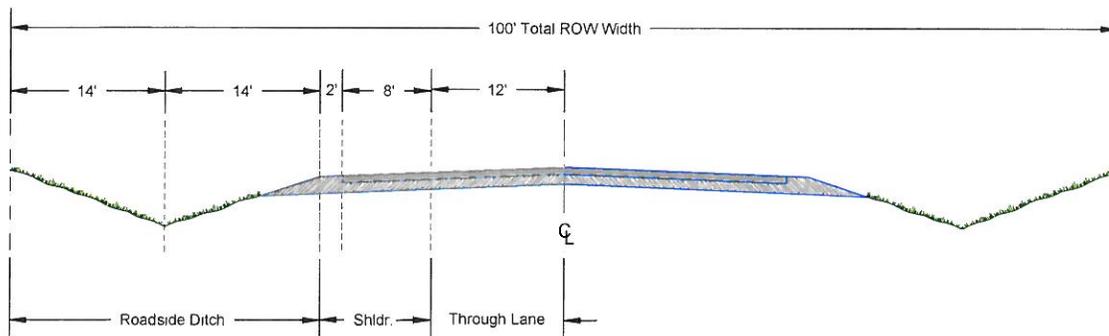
Typical Rural Principal Arterial Partial Cross-Section (4 Lane)
